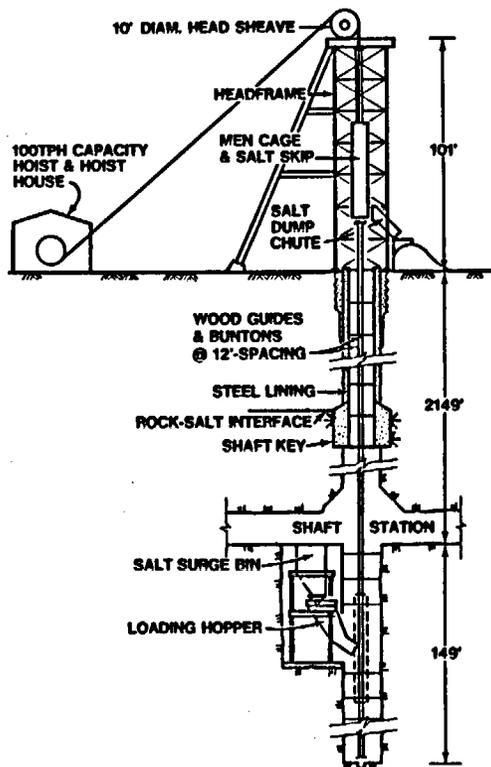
GENERAL ARRANGEMENT OF THE OUTFITTED EXPLORATORY SHAFT
